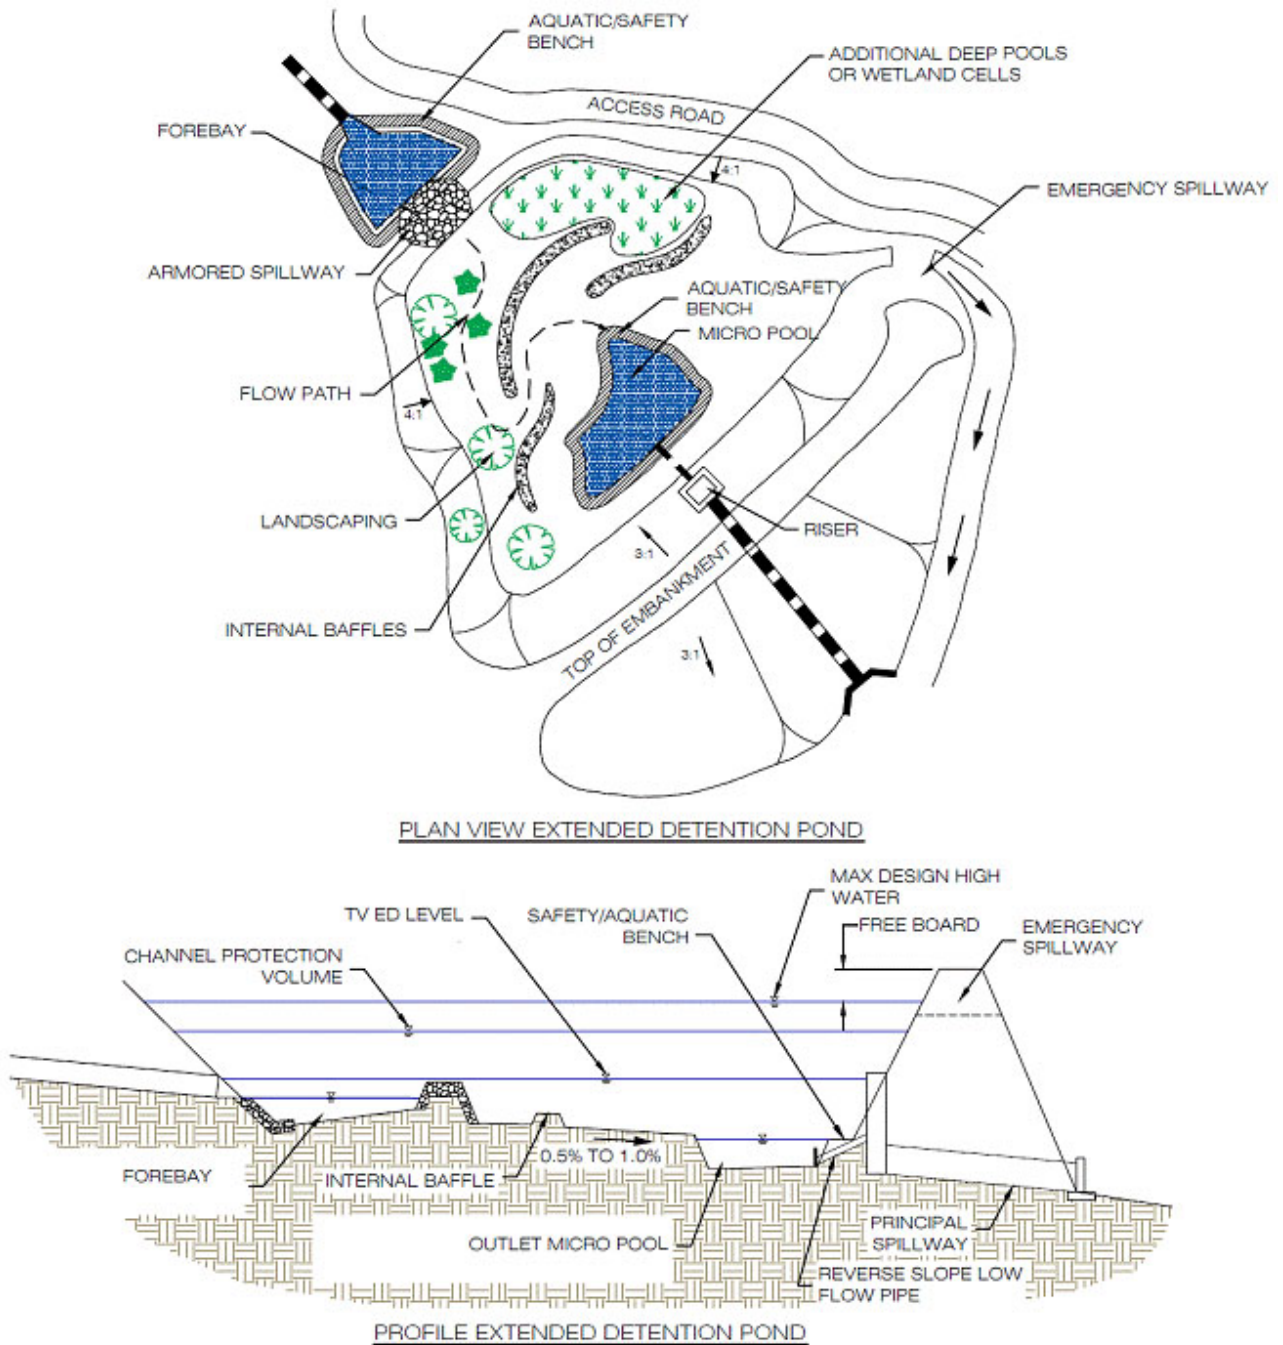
Typical Extended Detention Pond Details (source: VADCR, 2011)
